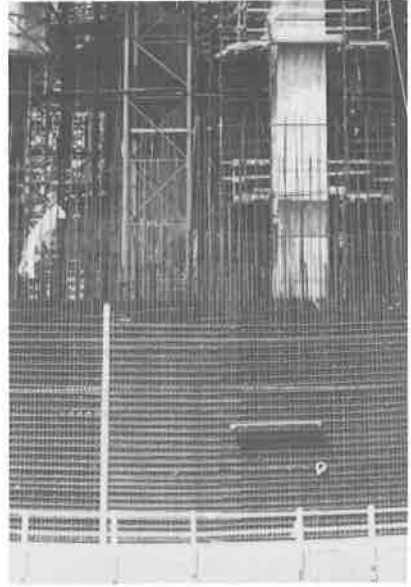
General View of Perimeter Wall Reinforcing. Because of heavy congestion of reinforcement, bottom 6 metres of the wall were conventionally formed.
